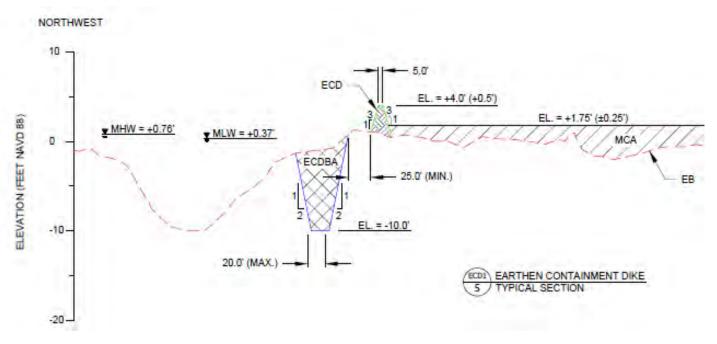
Earthen Containment Dike Typical Cross Section – Exterior Borrow
